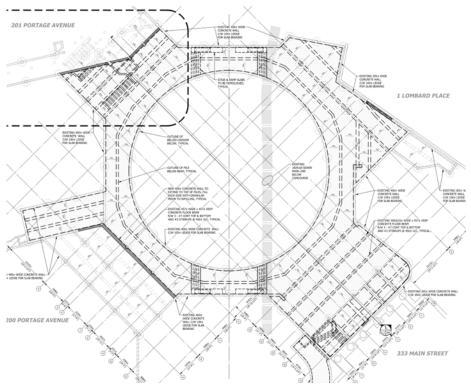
Extent of Demolition at Concourse Floor - Drawing S2.1
